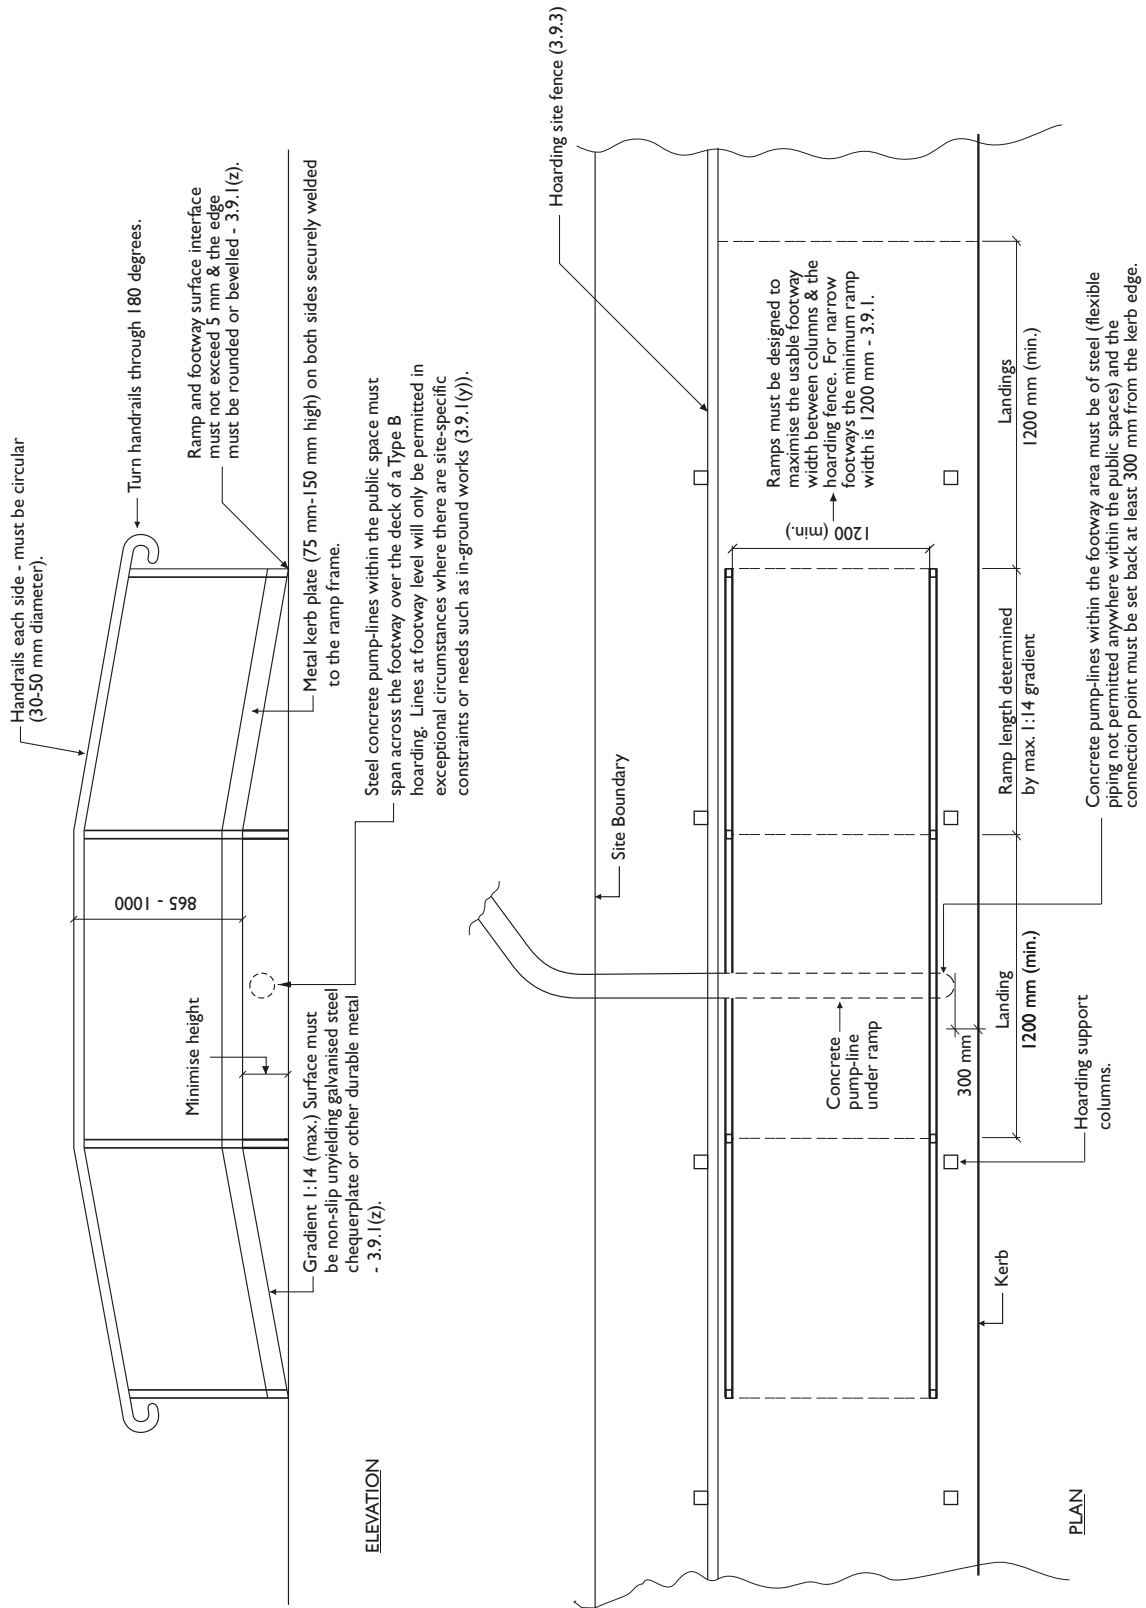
Design details for pedestrian ramps over concrete pump-lines (see Figure 73).
